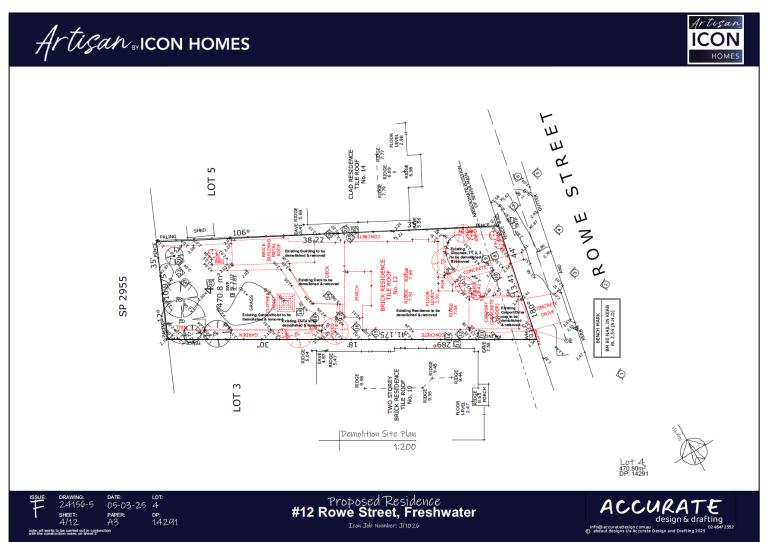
PROPOSED DEMOLITION SITE PLAN
